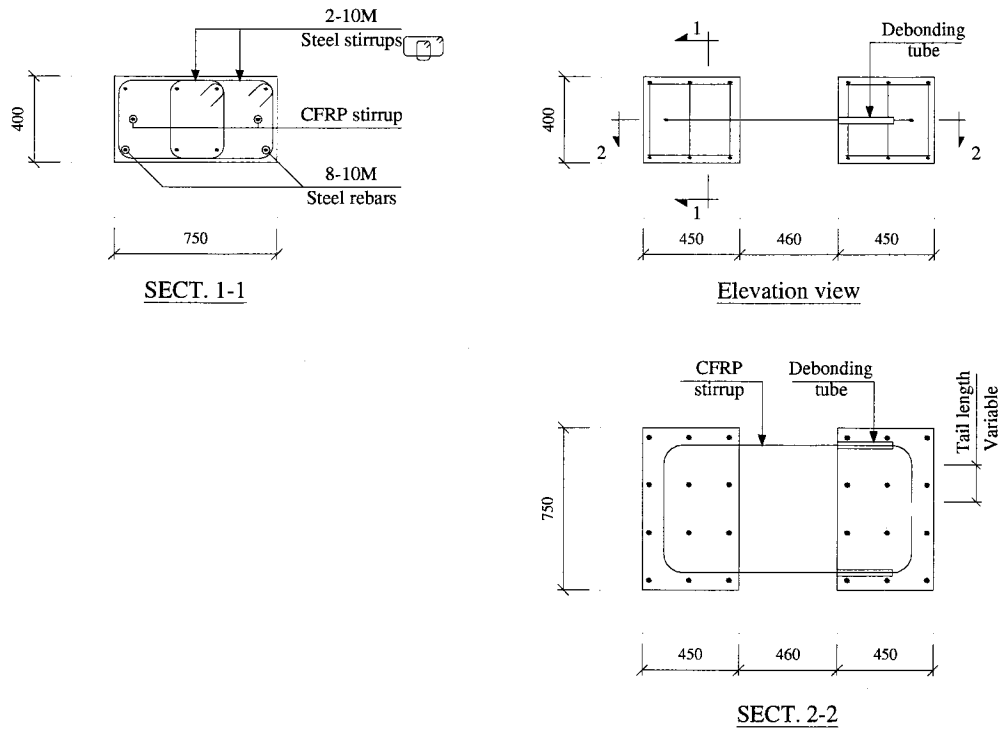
Concrete dimensions and reinforcement details of stirrups and bent bars specimens
